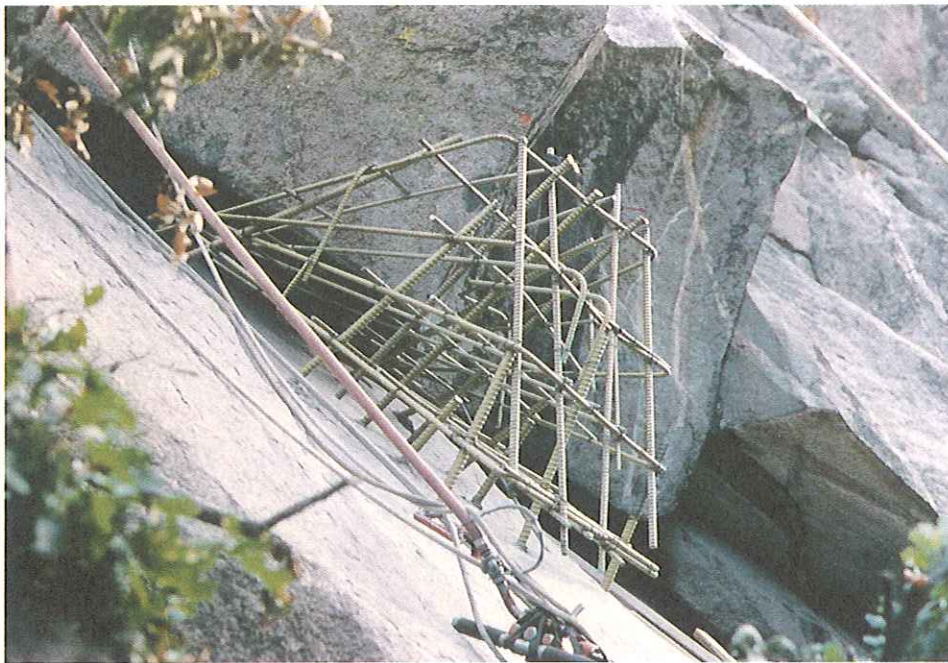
Fabricated rebar cage tied to the grouted anchor bars. Note the open joint below the large block (Courtesy Colorado Department of Transportation).
